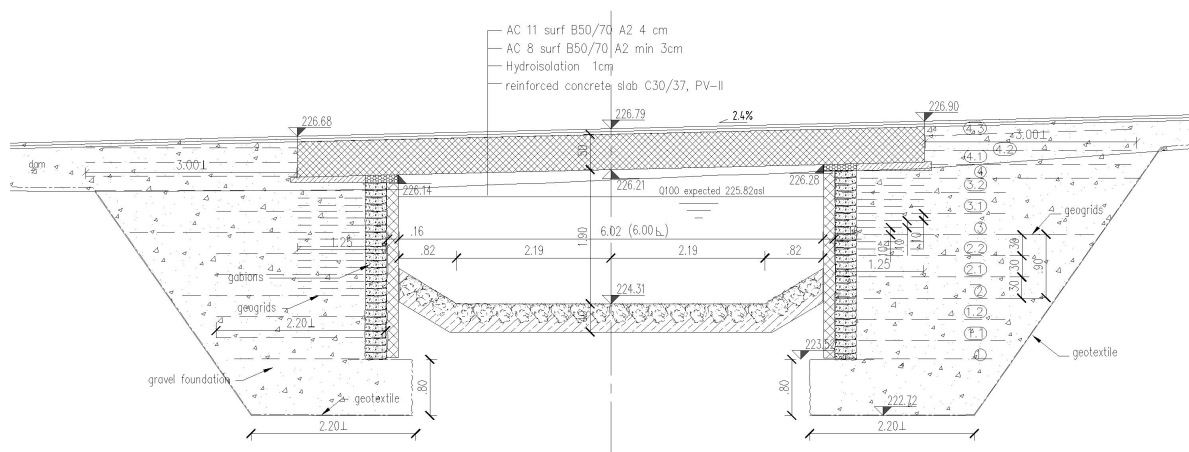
Longitudinal cross-section of newly designed bridge supported by reinforced soil abutments
